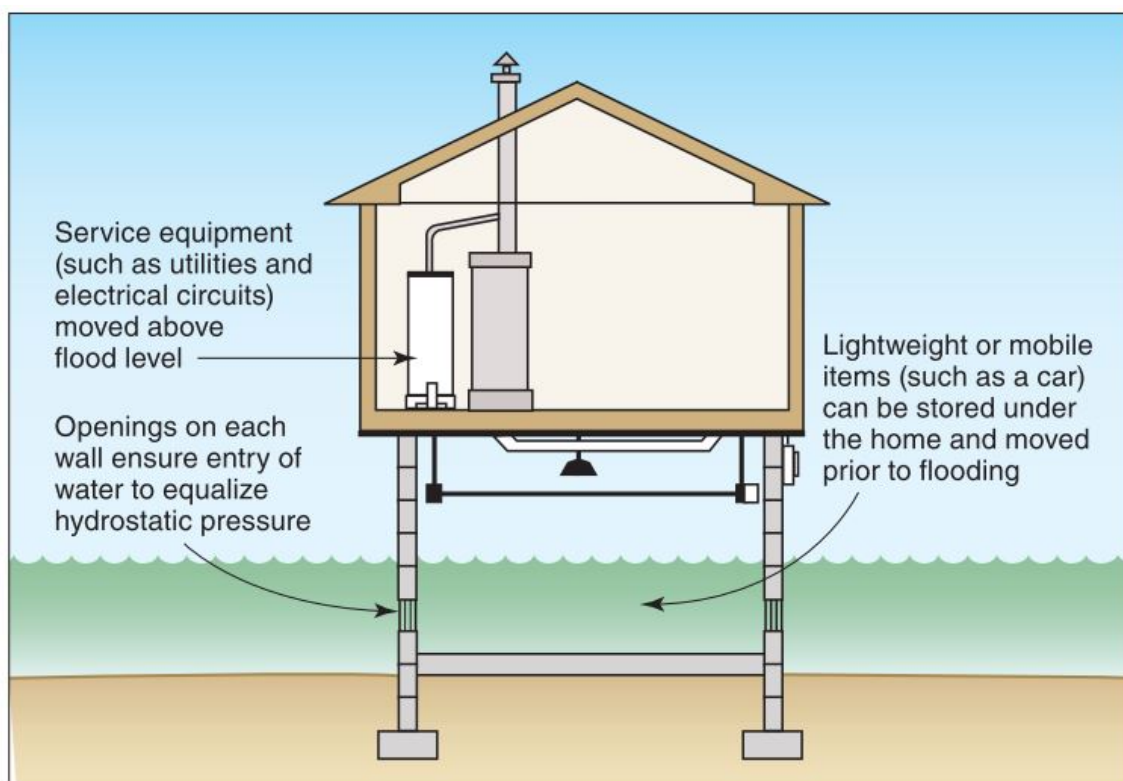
Example cross section of an elevated home using continuous foundation walls (FEMA, 2014a)
